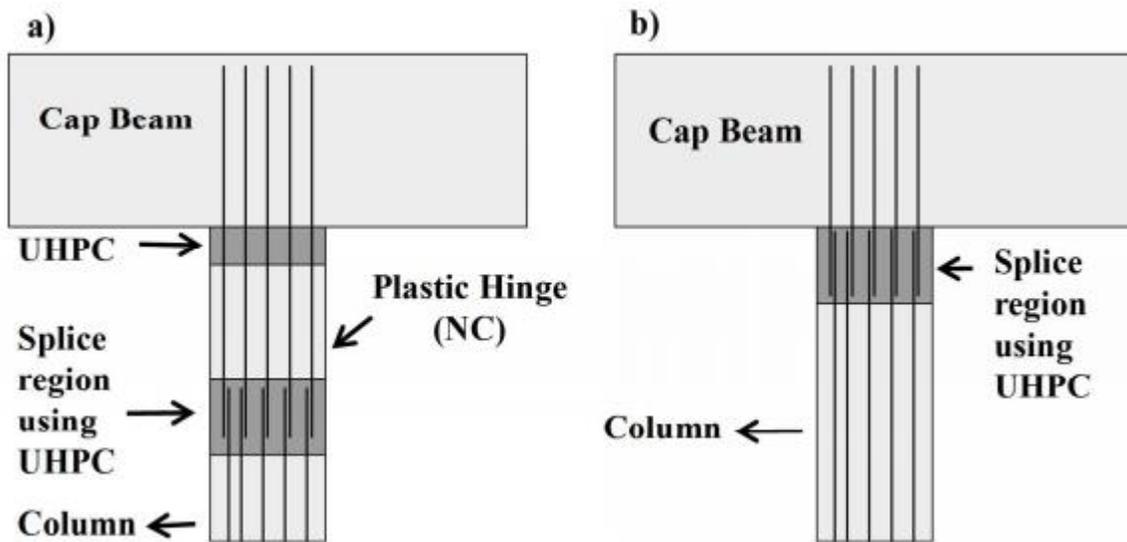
a) Seismic and b) non-seismic detail of UHPC connection of precast column and precast cap beam [40]
